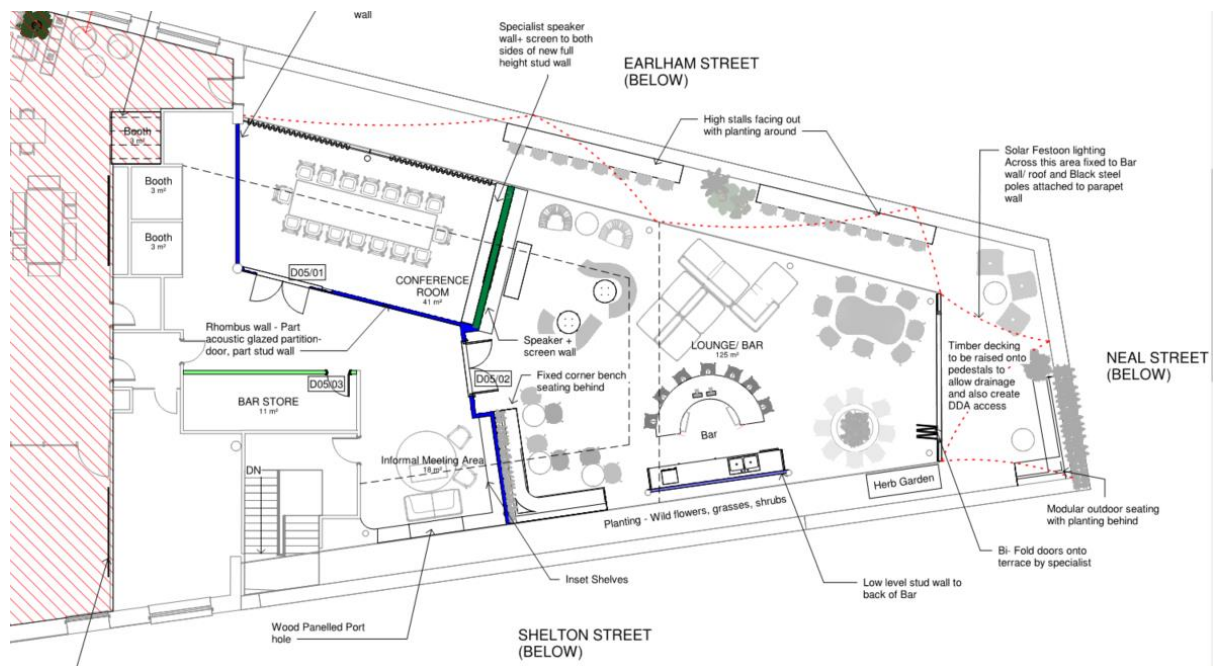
(above): Proposed 5<sup>th</sup> floor plan
